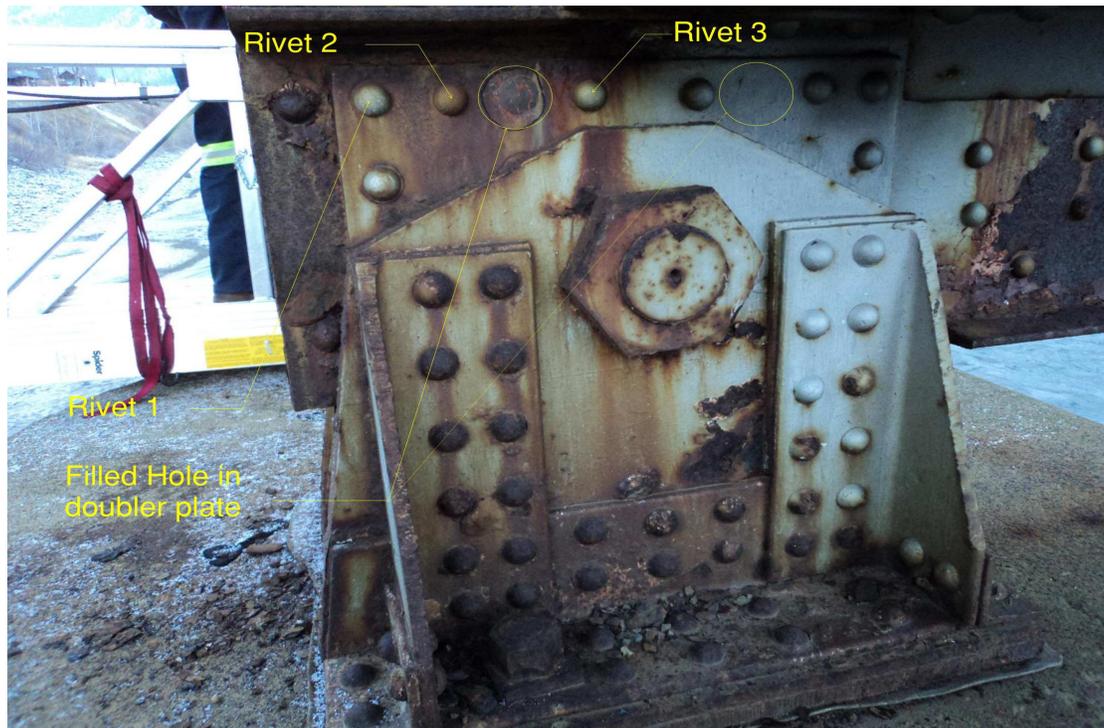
East Face of the West Bearing at Pier 2 for Span 3
